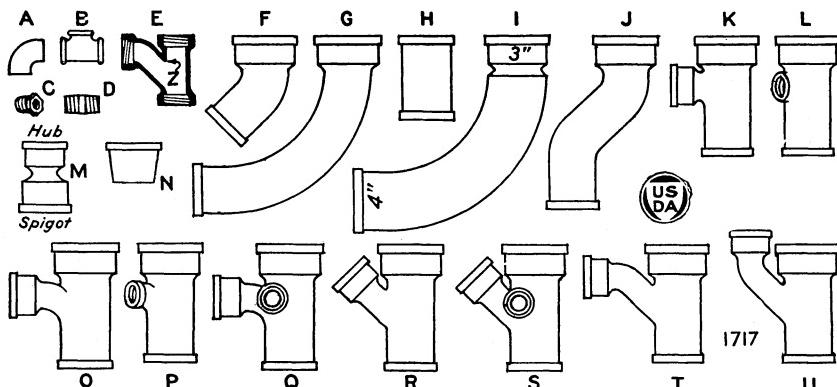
Fittings : A, plain elbow or ell, turns one-quarter of a circle or 90 degrees; B, beaded tee branch; C, shoulder bushing; D, shoulder nipple; these four are typical wrought water pipe fittings; E, section of 90-degree long-turn Y branch or TY drainage fitting recessed and threaded for wrought pipe; note that the point Z is below the center line of the inlet pipe, an important feature in soil and waste lines; F, eighth or 45-degree bend, cast-iron, hub and spigot type; G, long-sweep quarter bend; H, sleeve, sometimes used for joining two spigot ends on repair work; I, long-sweep reducing quarter bend, 4-inch spigot, 3-inch hub, often used at the bottom of 3-inch soil stacks; J, offset; K, T-branch; L, T-branch tapped for wrought pipe; M, reducer; an increaser has the spigot on the smaller end; N, plug; O, sanitary T-branch; P, sanitary T-branch tapped for wrought pipe; Q, sanitary T-branch with right-hand side inlet; R, Y-branch; S, Y-branch with right-hand side inlet; T, combination Y and eighth bend or TY fitting; U, upright Y-branch.
